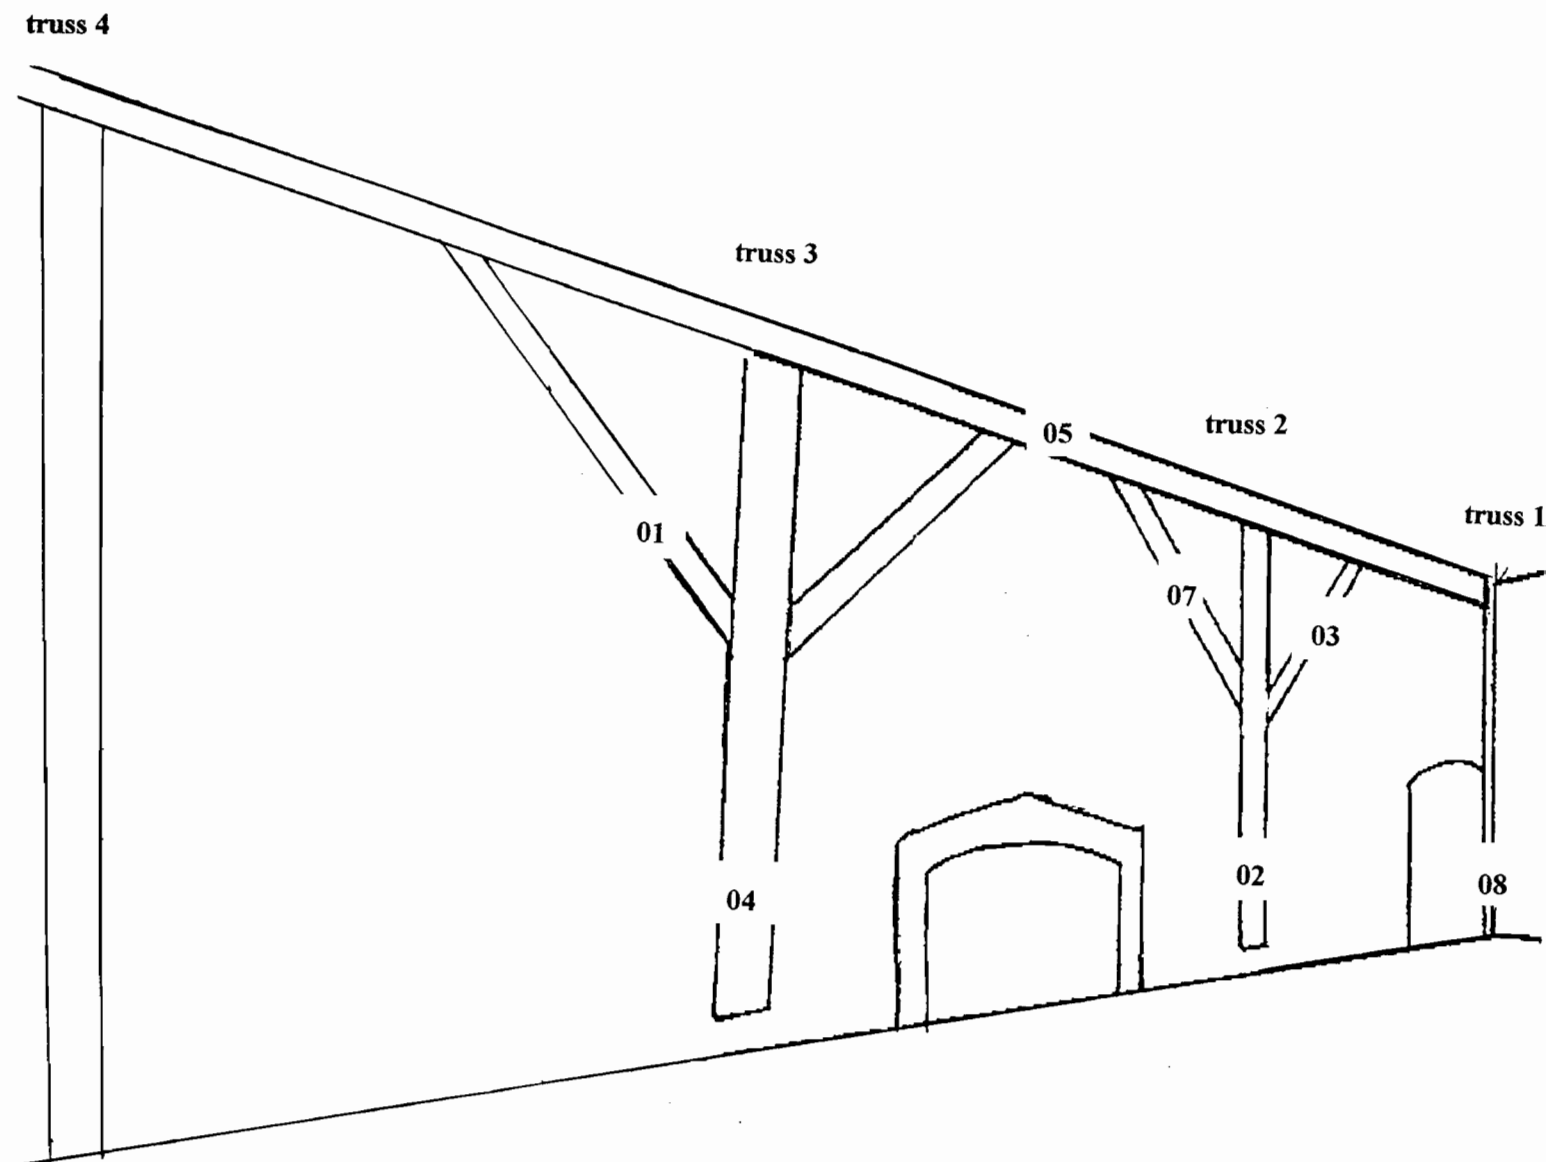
Sketch drawing of timbers in the east wall of the Keep to show position of samples
